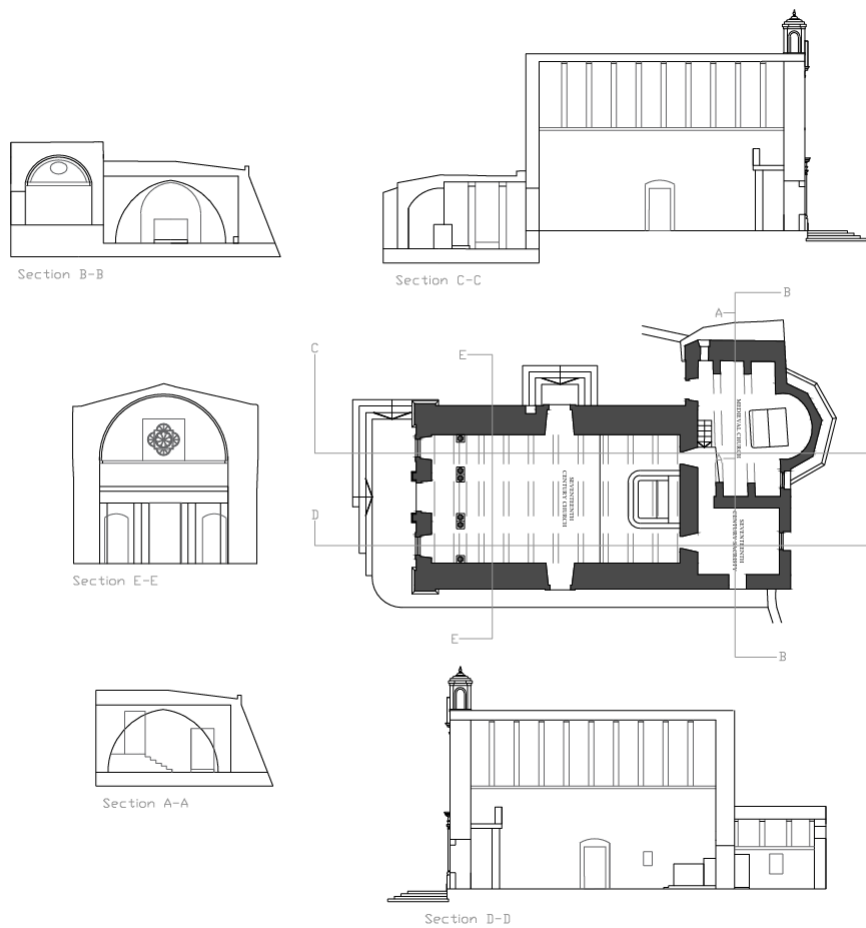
Plan and Sections of St. Matthew's Chapel (Author, 2024).
